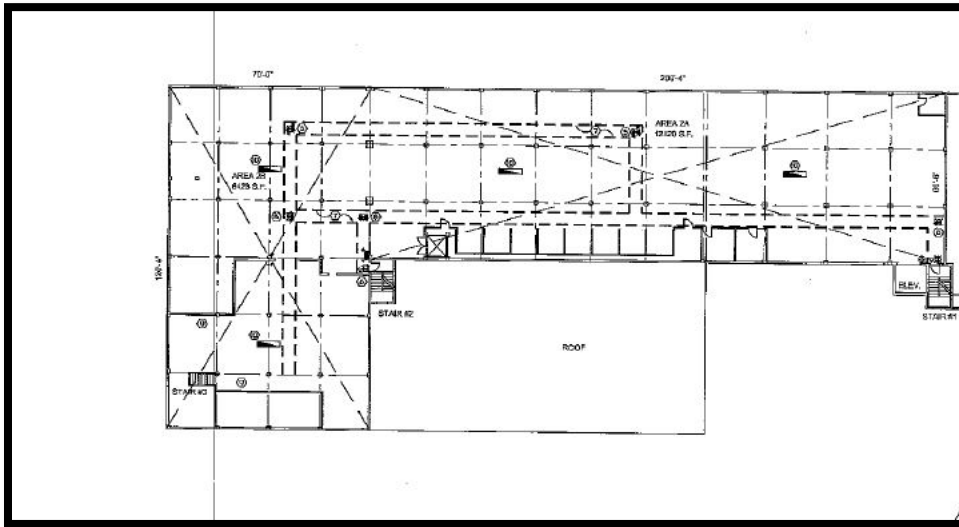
Grote Building Second Floor - the 1924 and 1925 portions of the building have a second floor.
